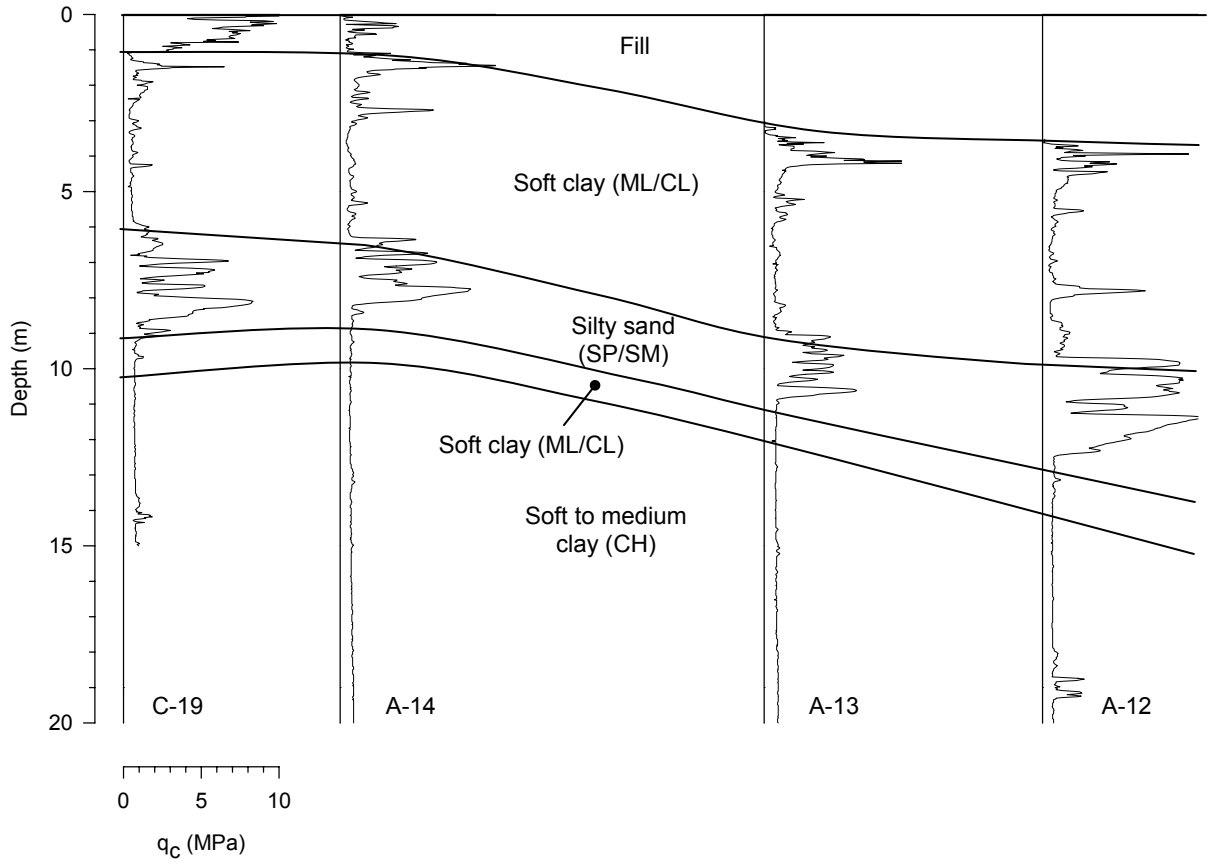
Cross section of soil layering - Shopping Center (section B-B)
